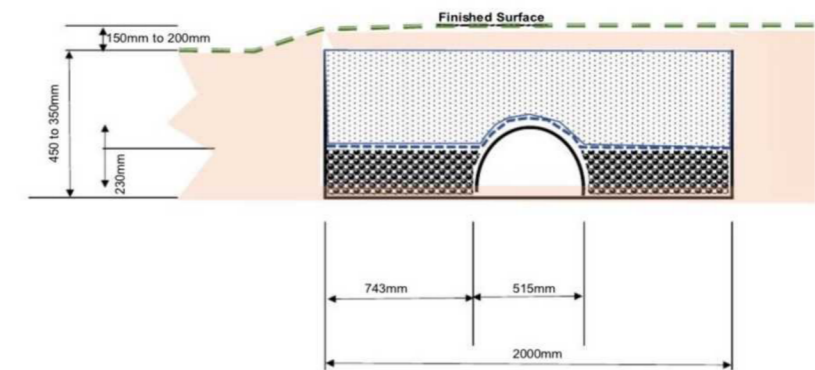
Conventional Rein Arch Infiltration Trench with Critical Construction Dimensions
